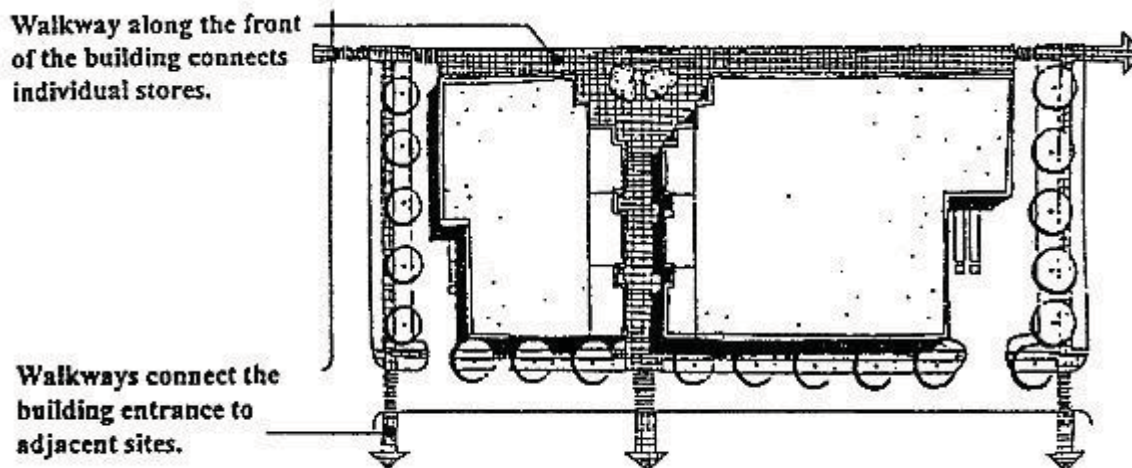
BUILDING WALKWAYS INTERCONNECTED
